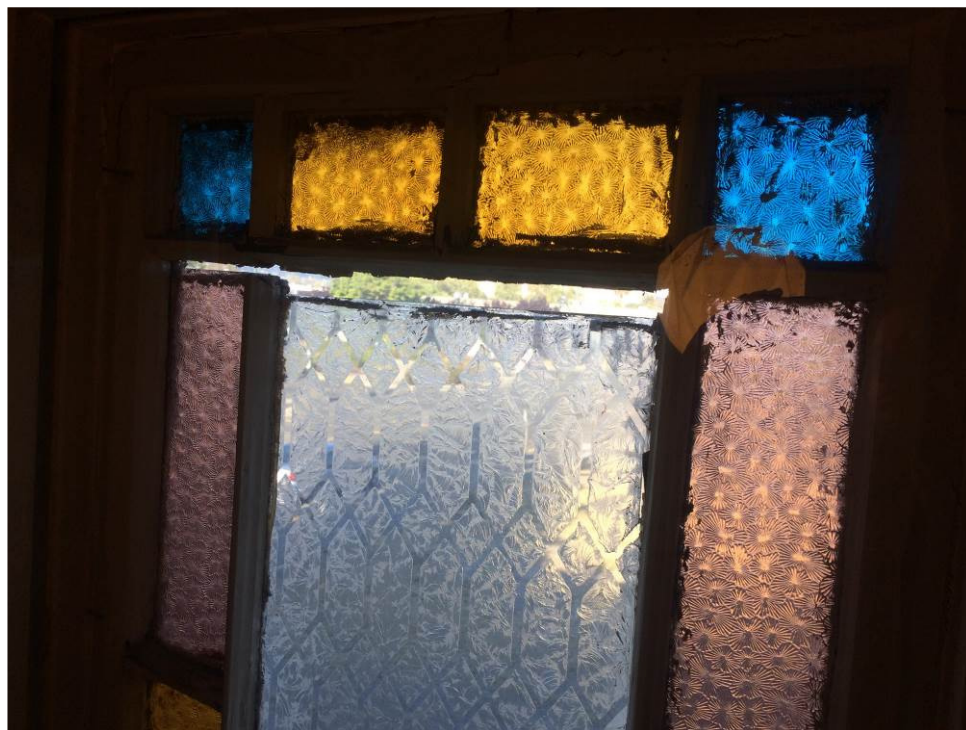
PHOTO J – Work Item 10 - Stained glass window in entryway. Panes have separated from sash.
